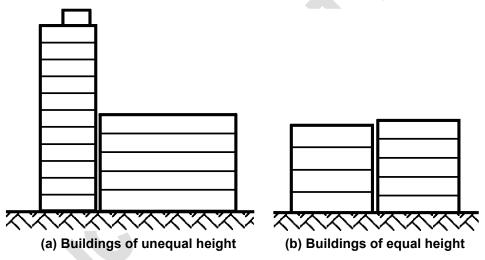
B.1: Example of differing floor elevations in adjacent buildings
